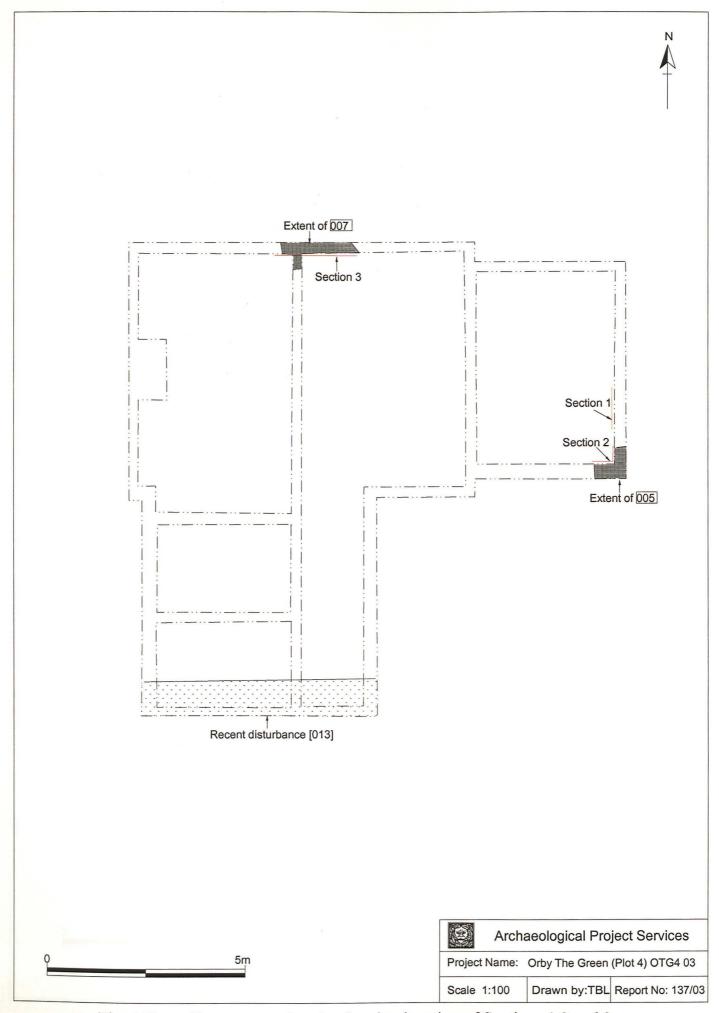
Plan of house groundworks showing location of Sections 1,2 and 3
